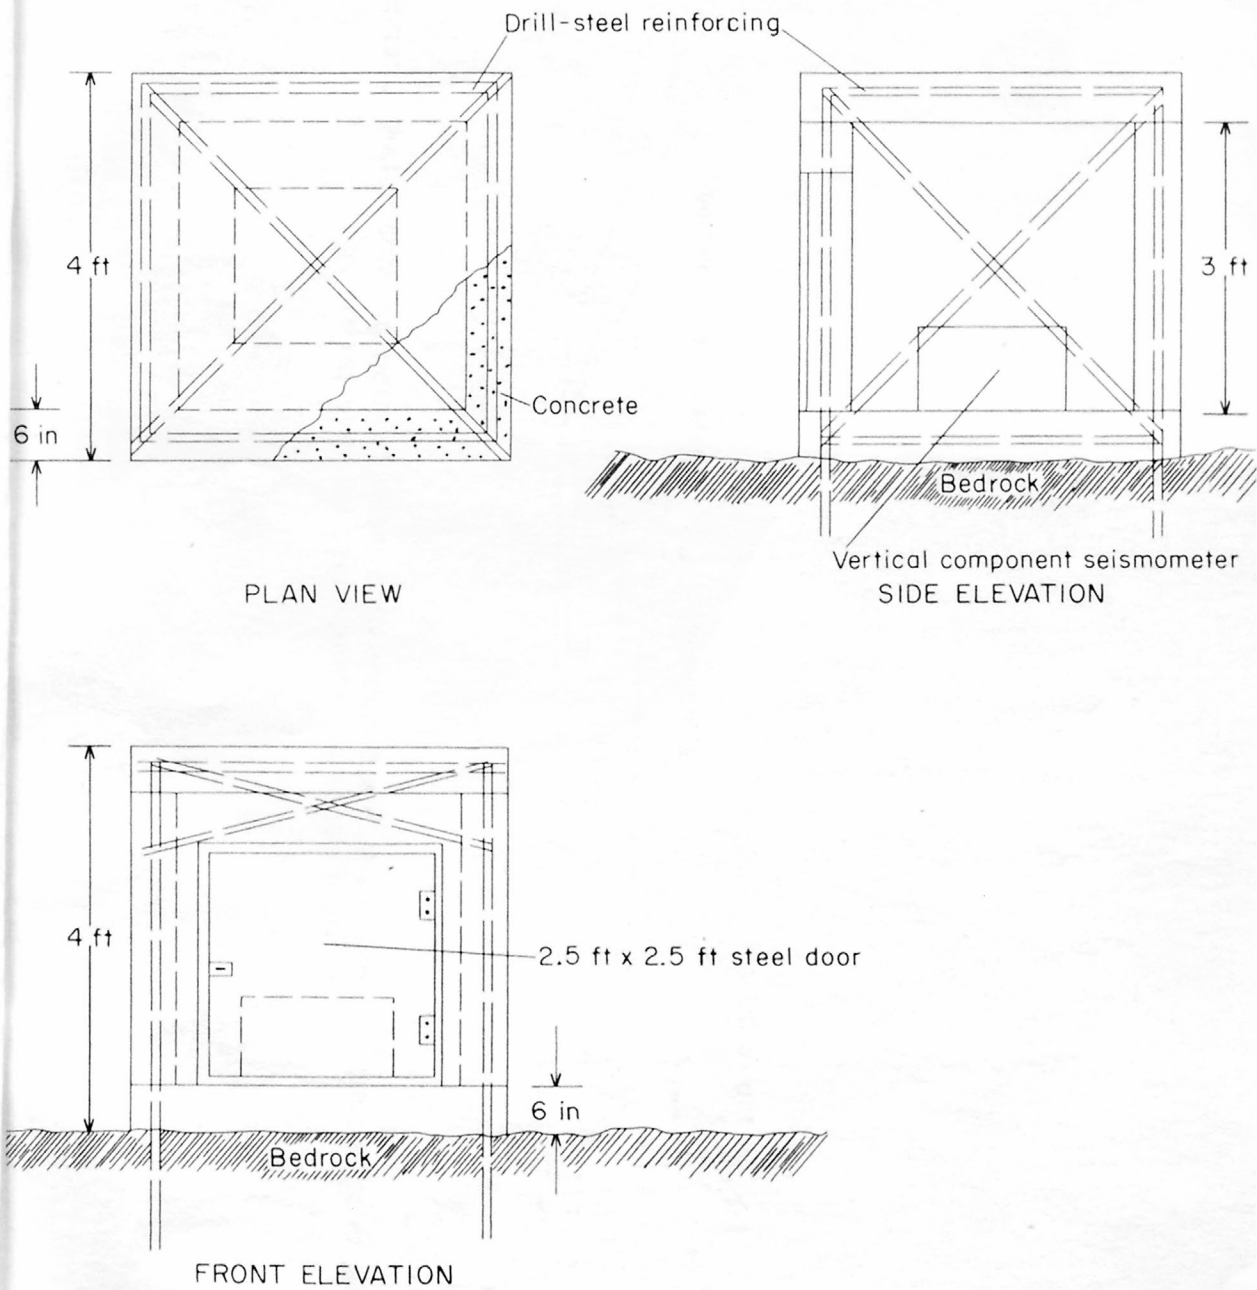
Sketches showing details of construction of concrete shelters for seismometers
